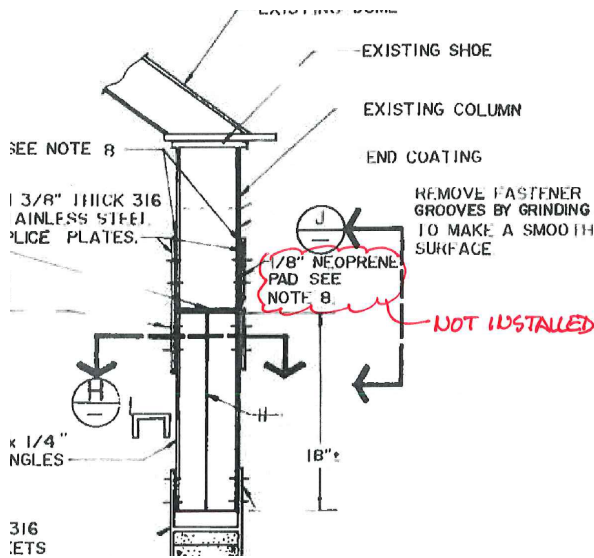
Retrofitted support post with new stainless-steel stub and plates in 1995
